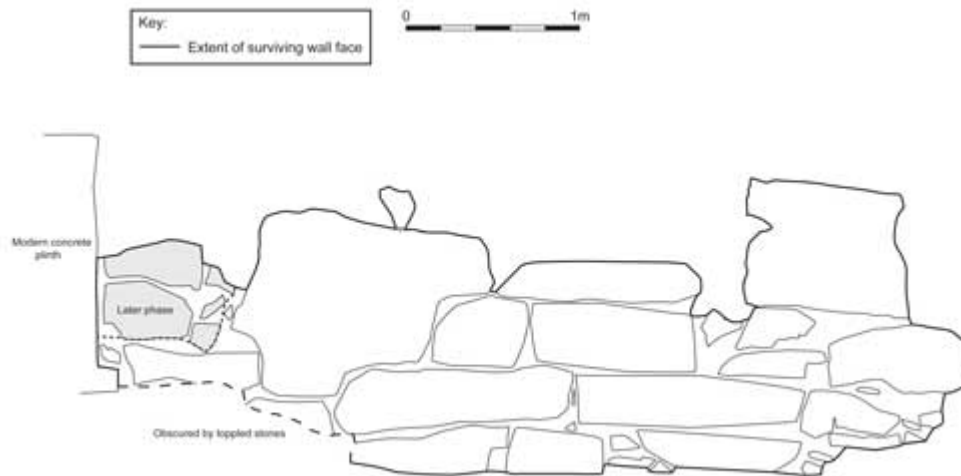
; Structure 3, Rusticated Bridge #1 (Upper Bridge): Elevation e
